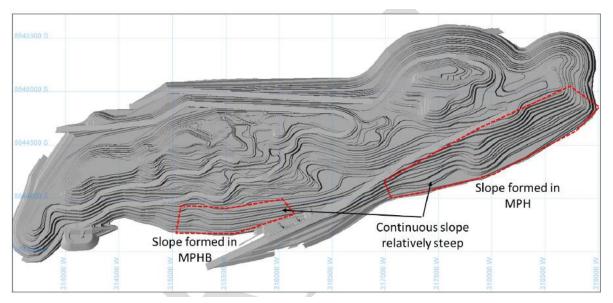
Sentinel Pit footwall design review, after XStract (2016)
